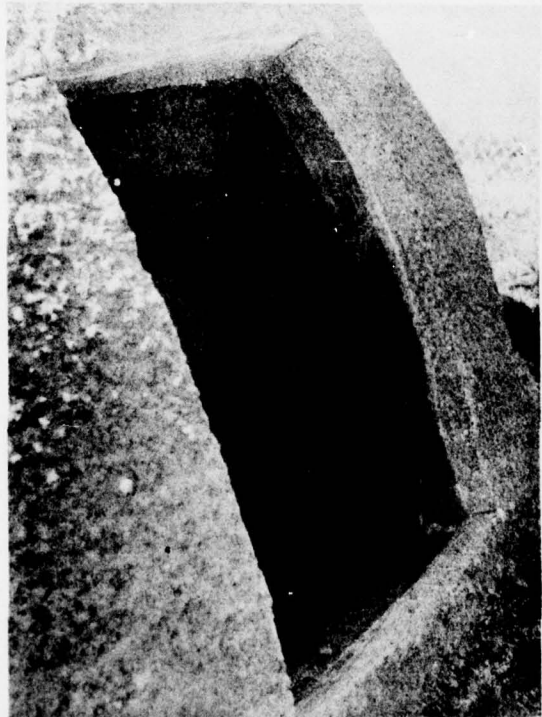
Opening cut into 15-ft (4.6-m)-diameter by 7-ft (2.1-m)-high steel fiber shotcrete dome with demolition saw. The foam and shotcrete are each 3 in. (.076 m) thick.
